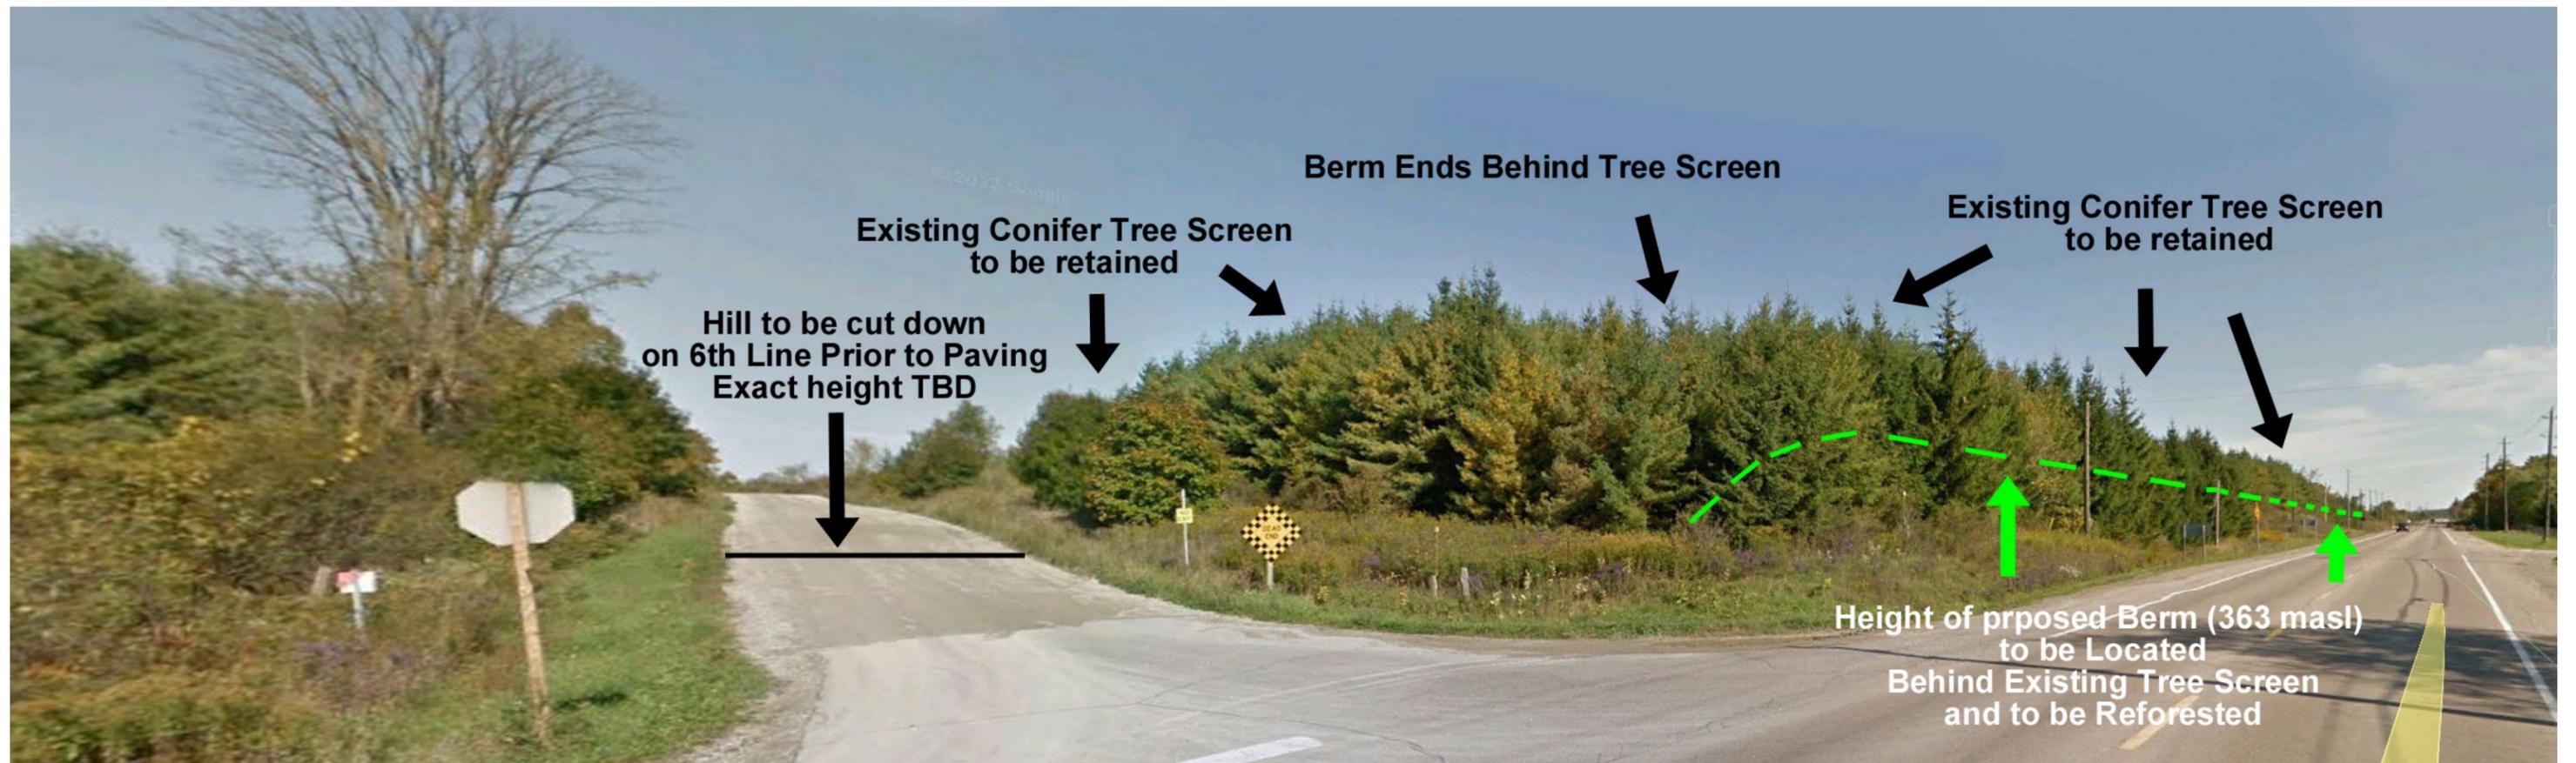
Corner of Sixth Concession and Highway 7- Quarry and Berm not visible behind tree screen.
